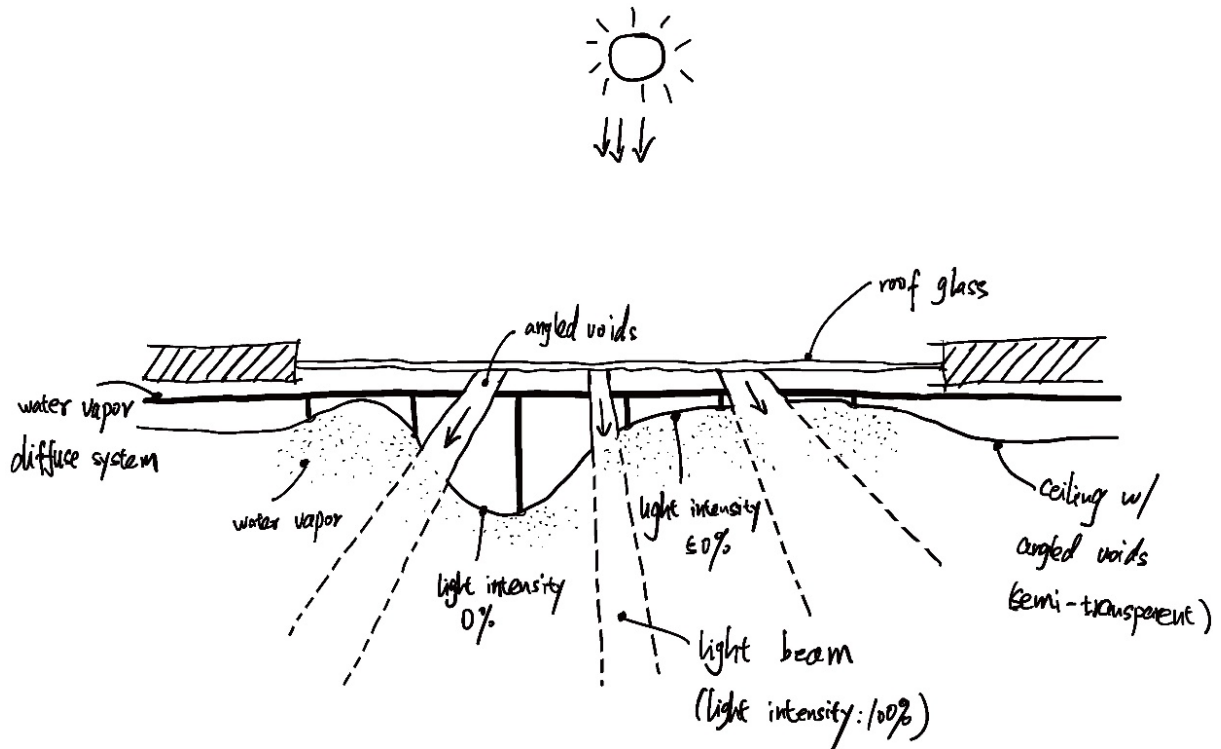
Section of ceiling design that installs a water vapour diffuse system to reveal light boundaries.
